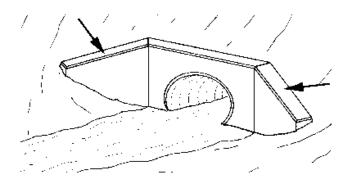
, Wing wall around a culvert (Ettema et al. 2006)
